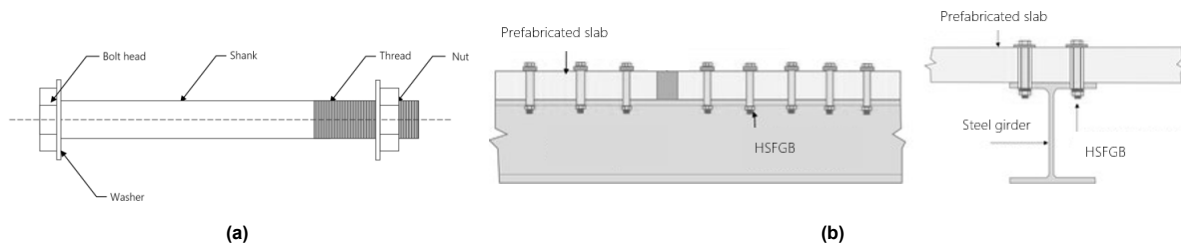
(a) HSFGB for concrete deck-to-deck connection and (b) application of HSFGB comprising precast concrete slab components
